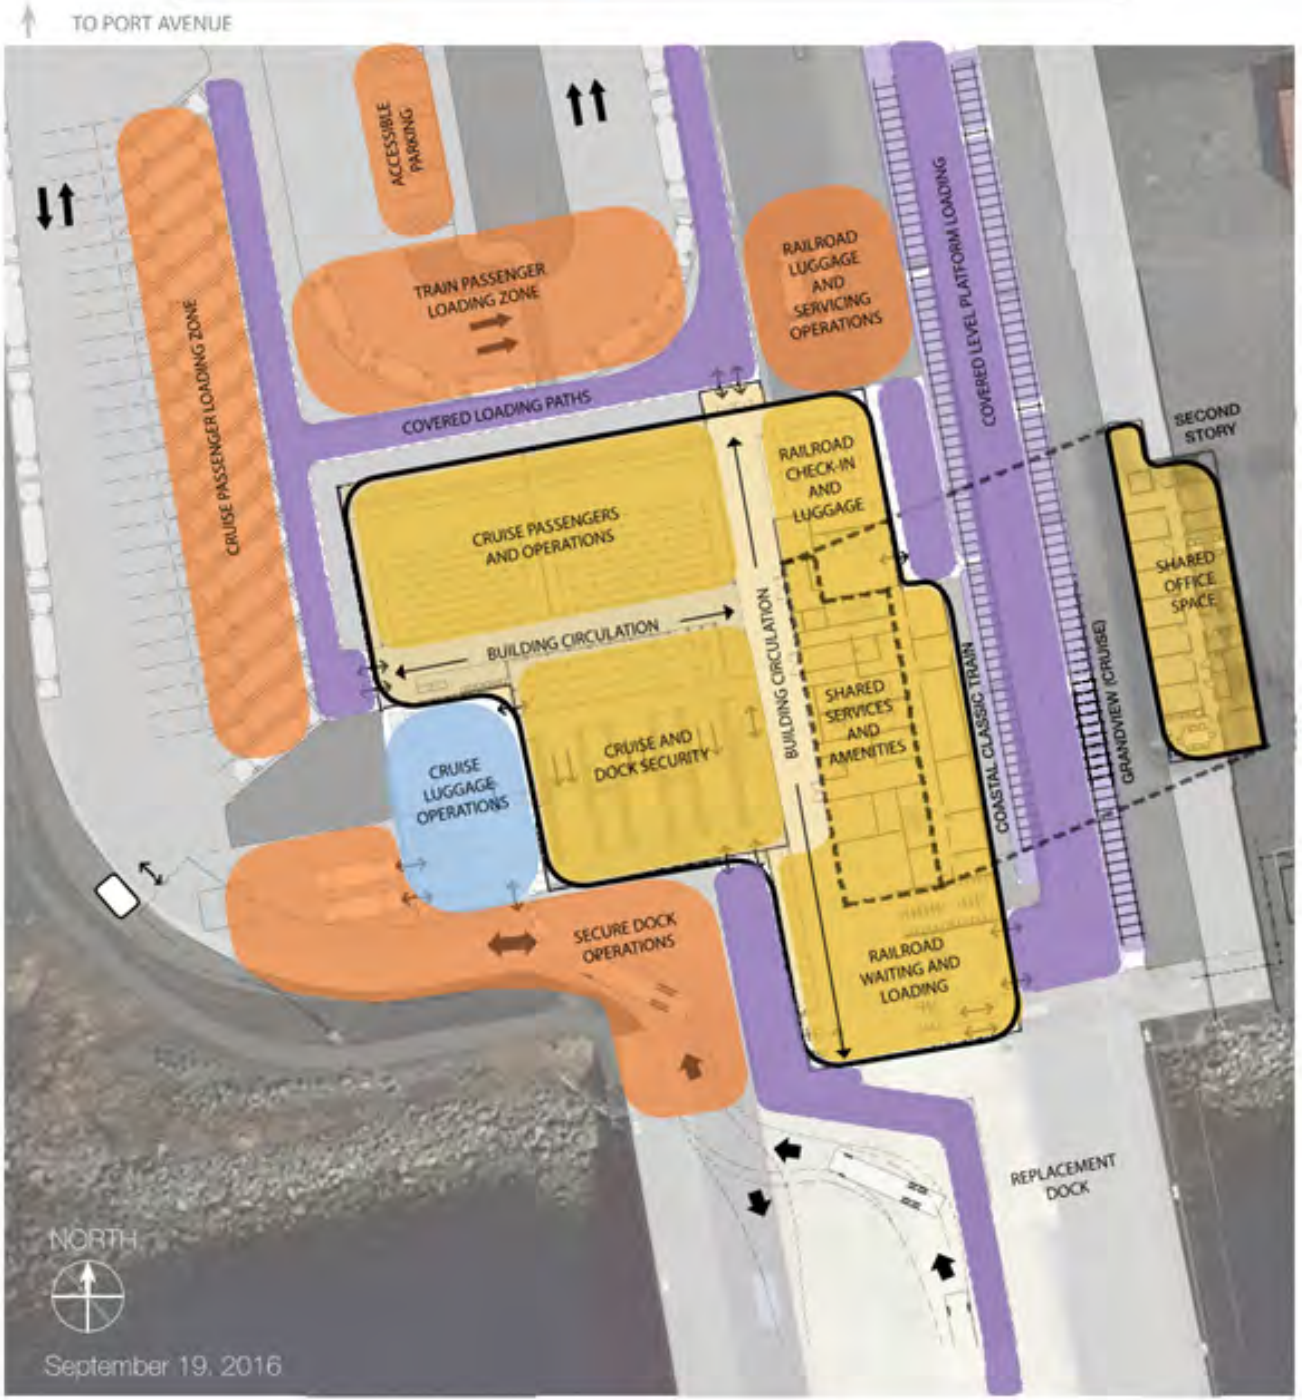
Proposed Internal Layout for Combined Terminal and Depot Building
